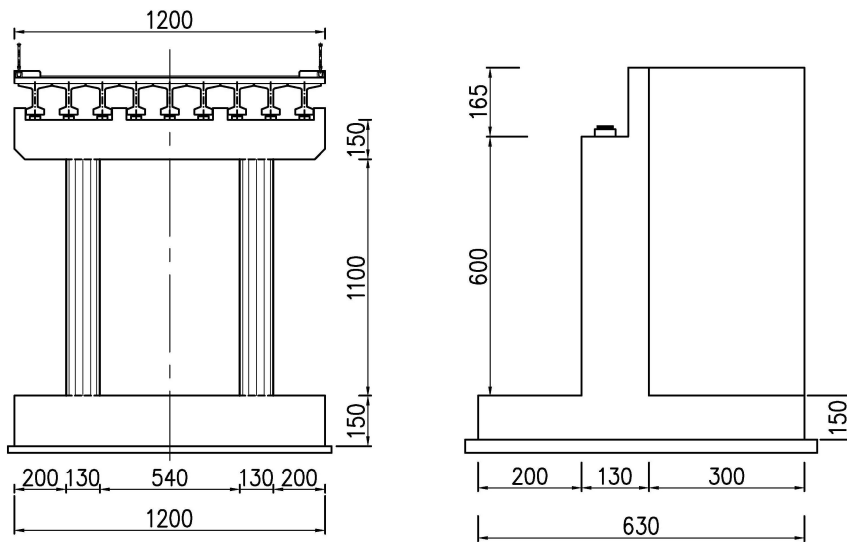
Typical cross-sections of (a) pier, (b) abutment of the benchmark bridge (Dimensions are in centimeters, drawings are not in scale.)
